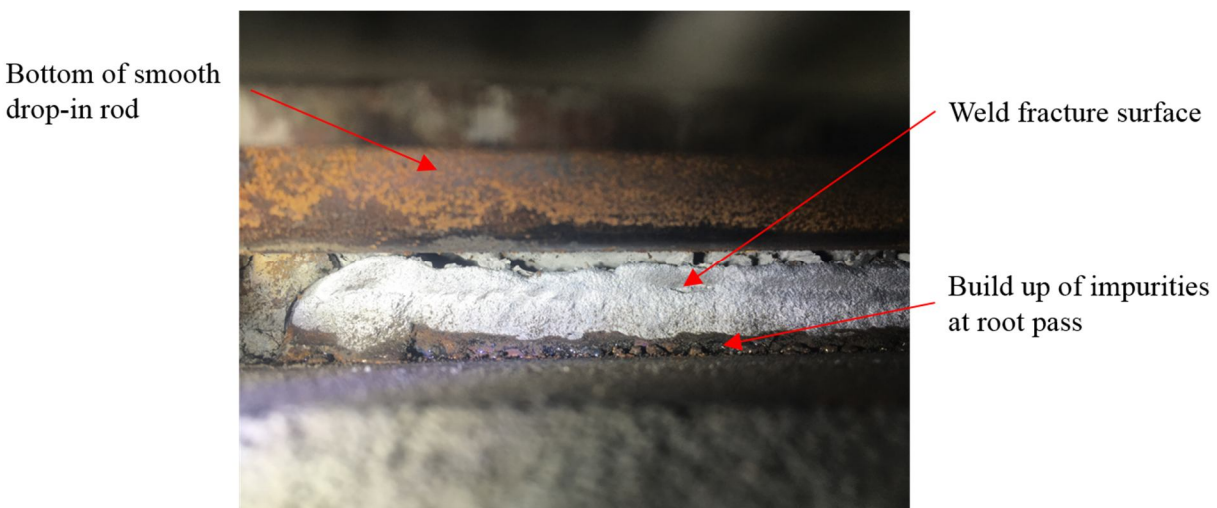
Welded connection failure, view looking N-S on welded connection from underneath specimen
